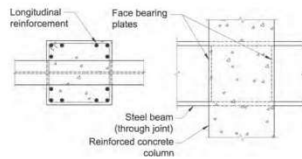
Reinforced concrete column-to-steel beam moment connection.
